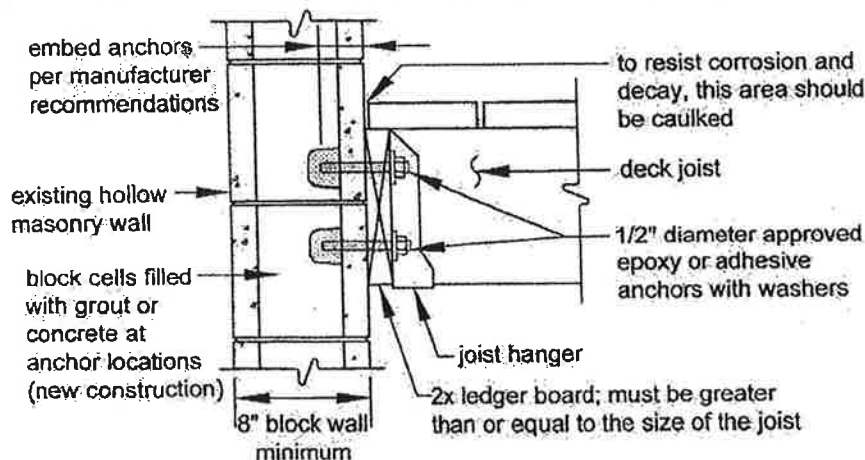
Attachment of Ledger Board to Foundation Wall (Hollow Masonry)
